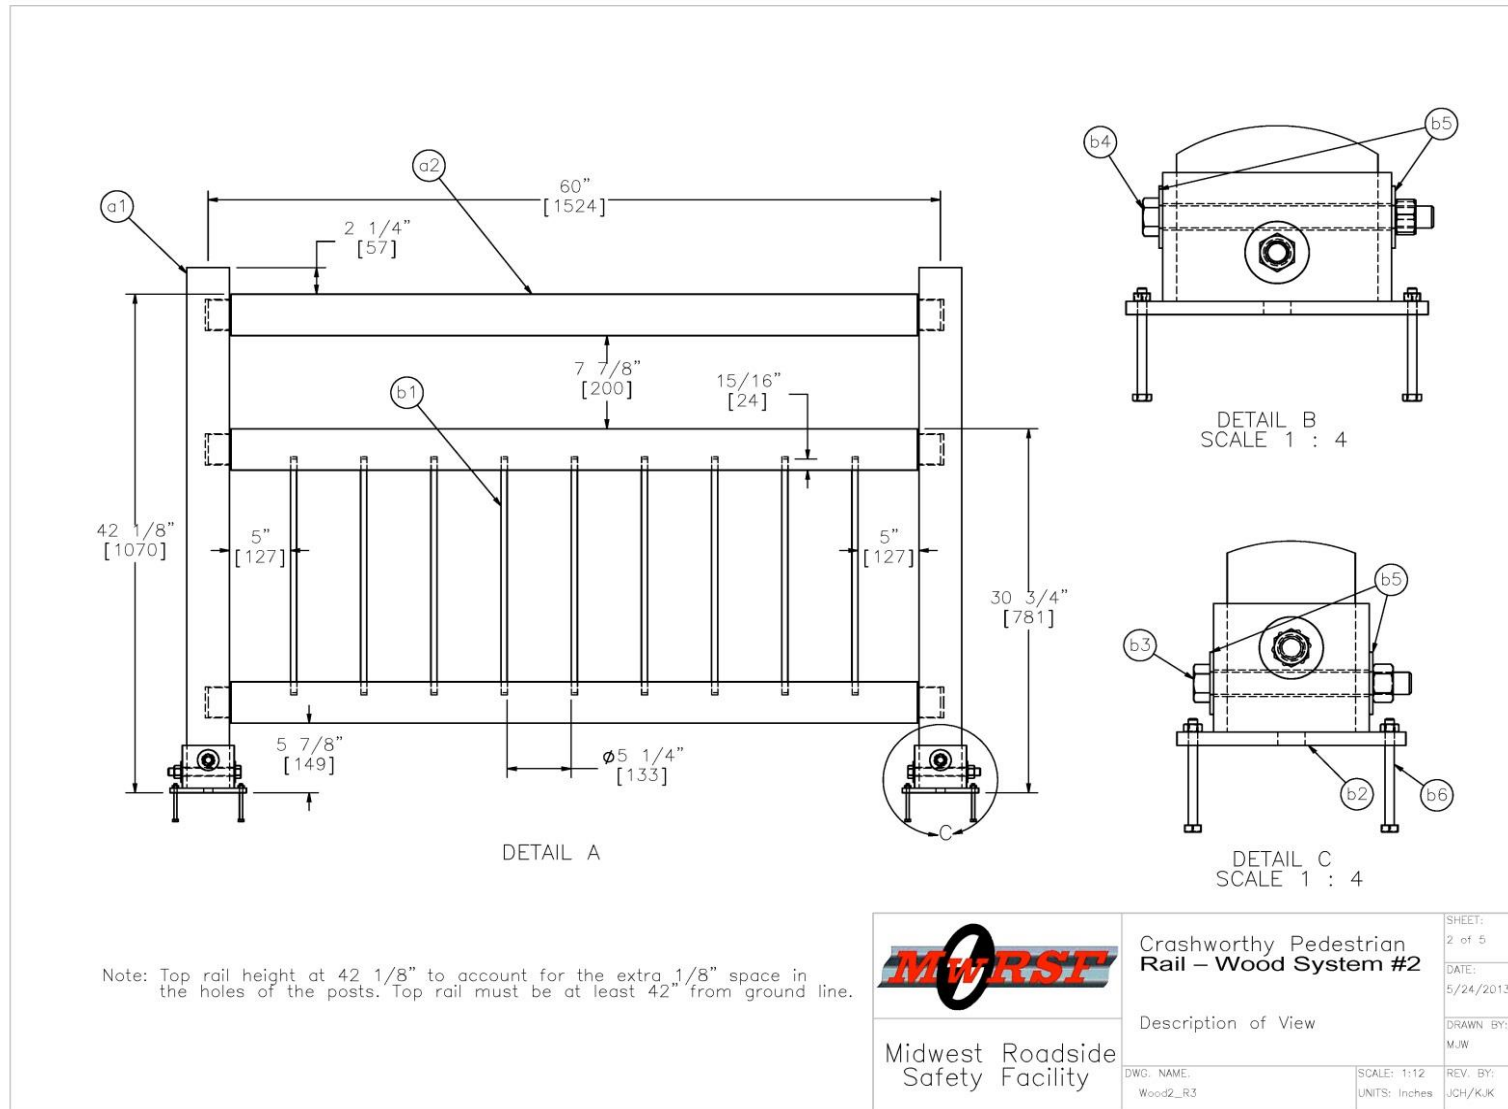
Cutout Wood Rail, Design Concept WOOD2 (Sheet 2 of 5)
